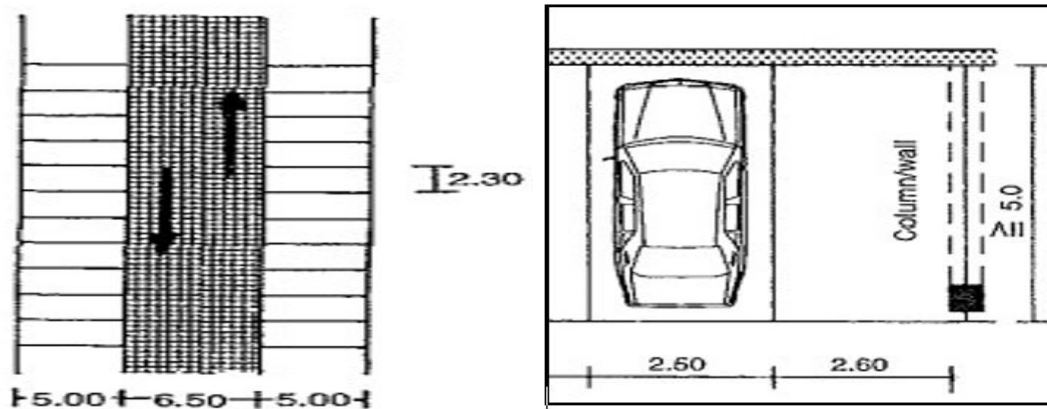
Dimension of cars parking and cars movement inside parking [1]
